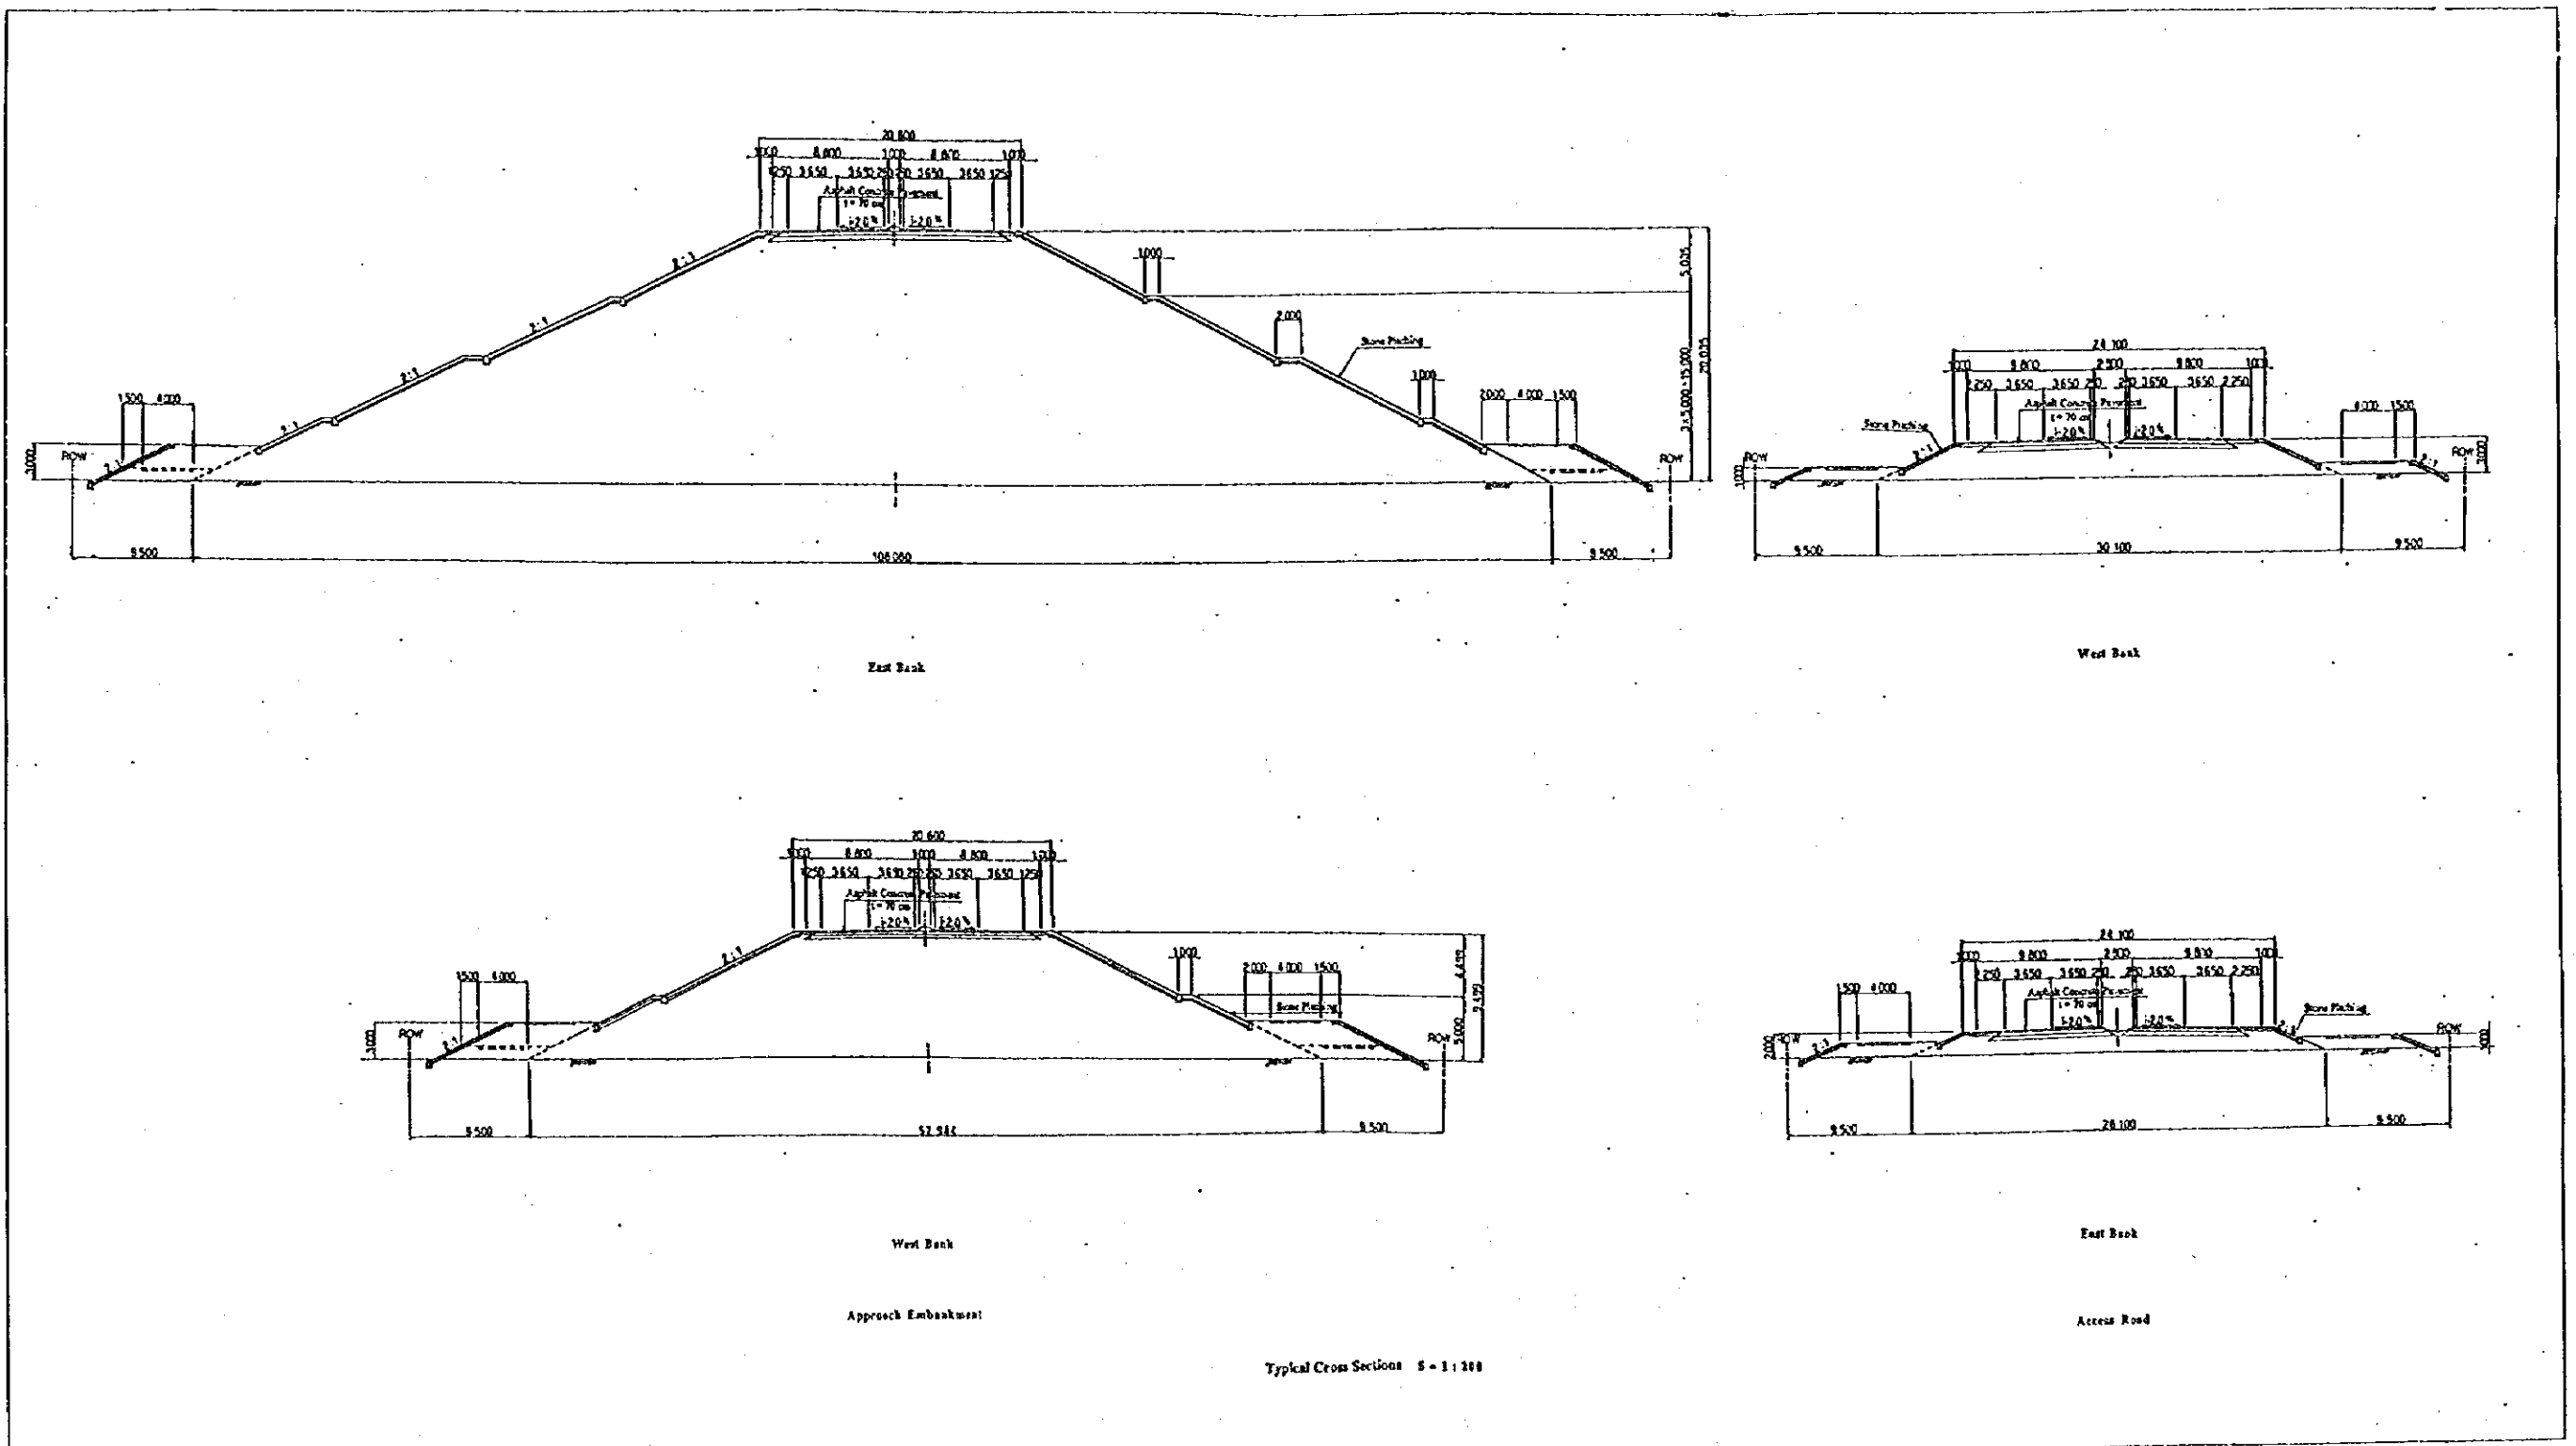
Typical Cross Sections of Approach Embankments and Access Roads
